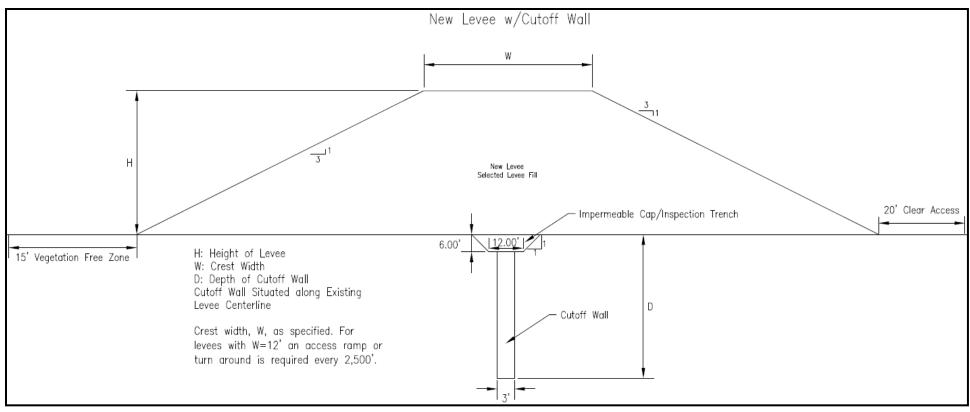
New Levee with Cutoff Wall Typical Plan
